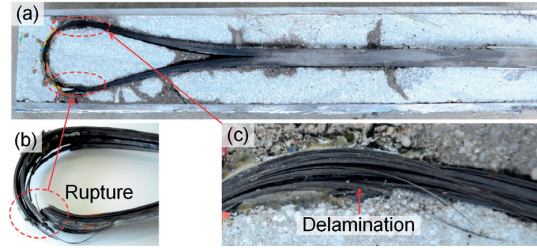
Failure mode of anchor S605: (a) cut view of ground-side anchor head; (b) rupture of embedded strap at gage location; (c) strap delamination at gage location
